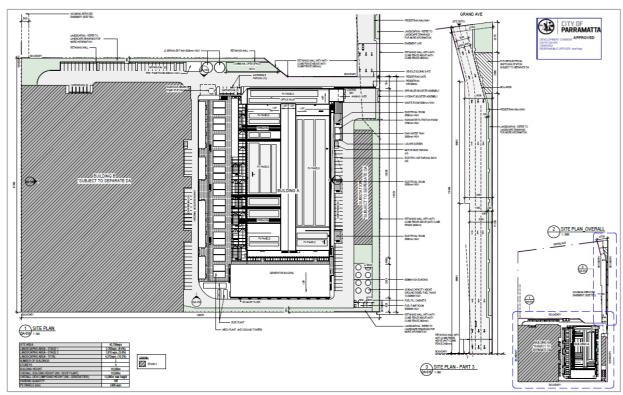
Approved Site Plan with Stage 2 area subject to the SSDA shown hatched Source: Greenbox Architecture
